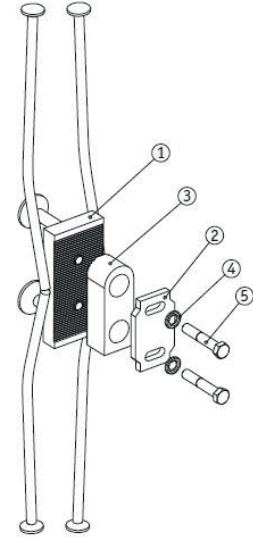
PCs and PCs UP system with Deltabeams and detailed view to PCs Corbel parts
